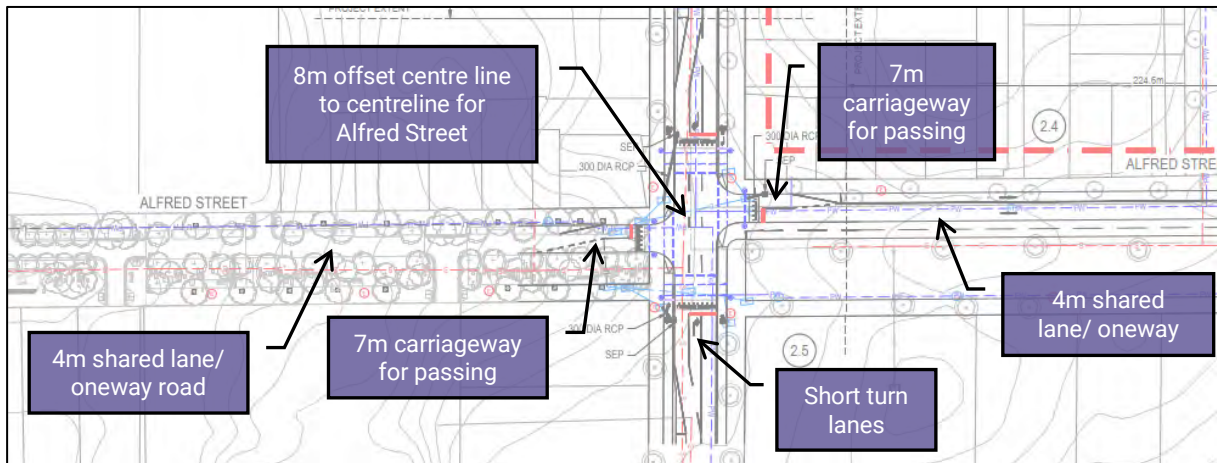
Excerpt of Intersection Works from Macaulay draft DCP – Boundary Road/Alfred Street
